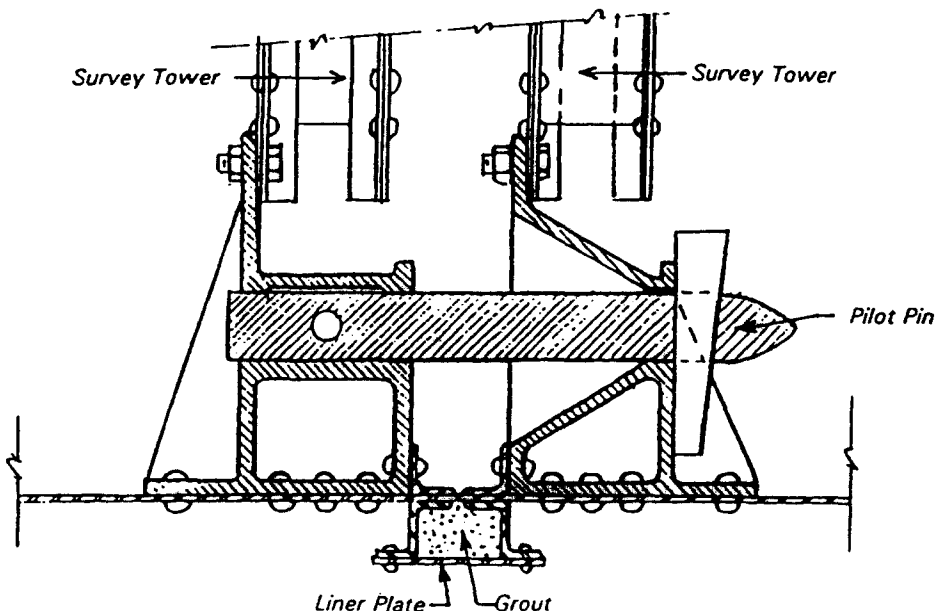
Joint detail for the Harlem River Tunnel (1914).
